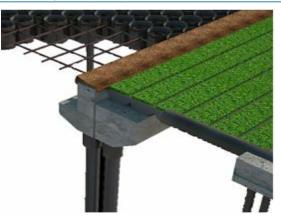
Perspective shot of the use of pipes as basins for planting Source: Designed and drawn by the author
